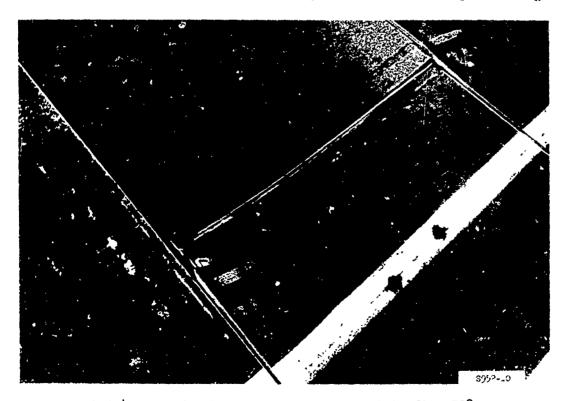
Test section III, lane 1, item 1, prior to traffic
